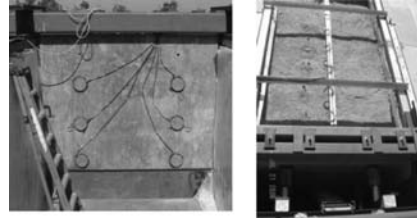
Soil container inside lining (left and right sides) and test wall with pressure sensors, and test setup overhead-view showing jacks and load cells behind wall (Wilson 2009).
